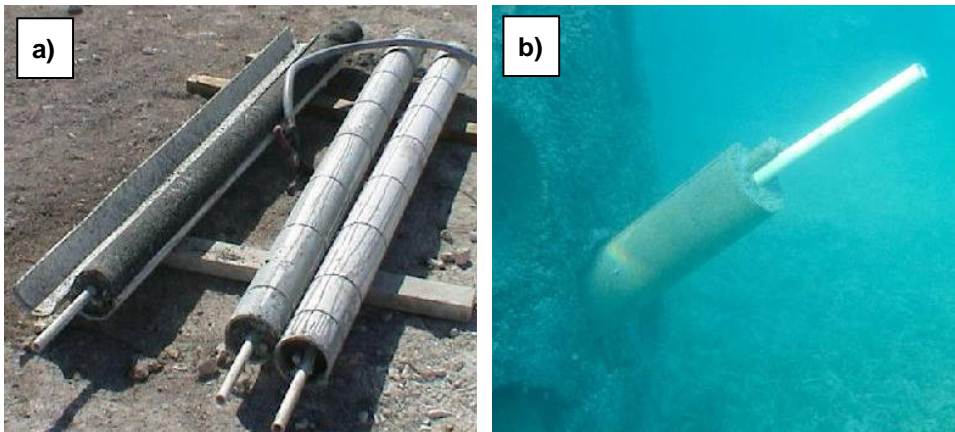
Battered piles (Reef Ball Foundation, 2008).
